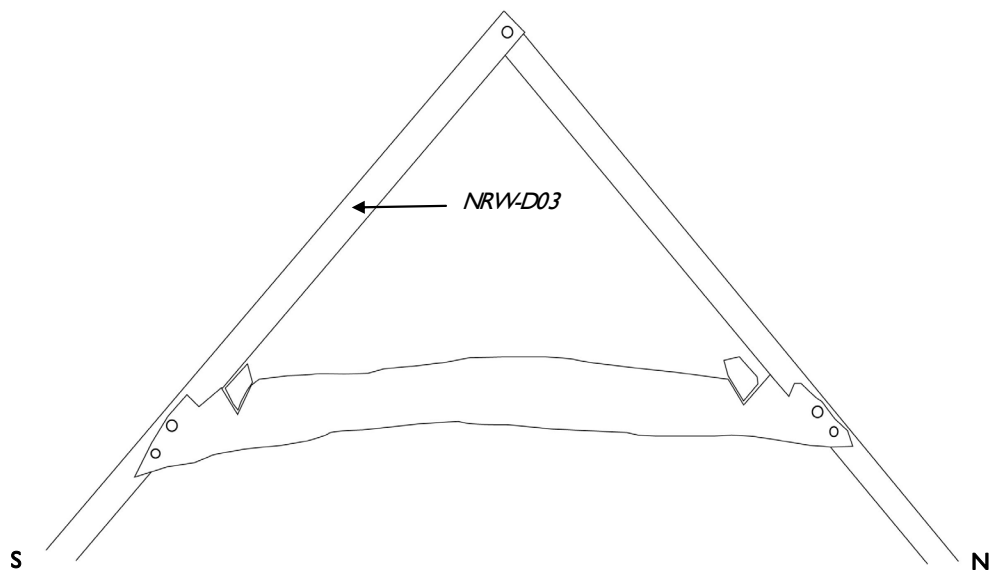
Location of sample on common rafter frame 7, viewed looking west
